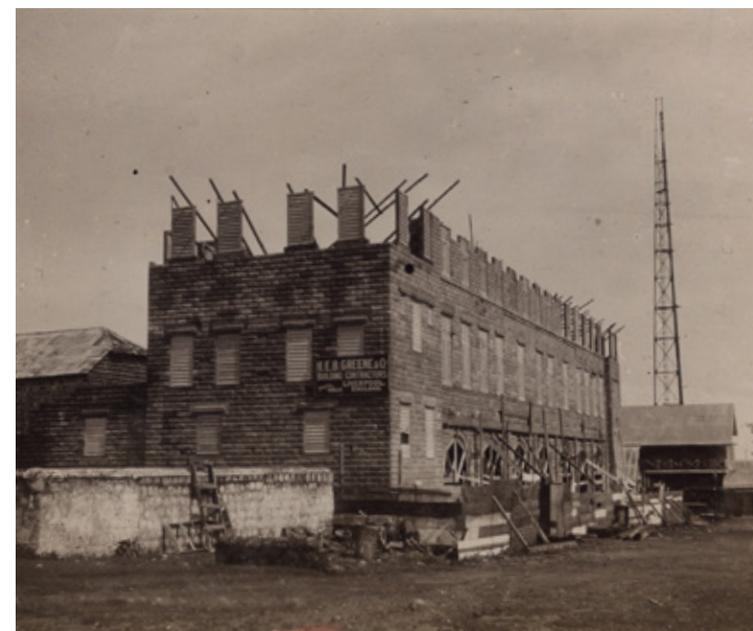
Big Market Construction, 1913, Unilever Archive, UAC 1/11/9/12/100
